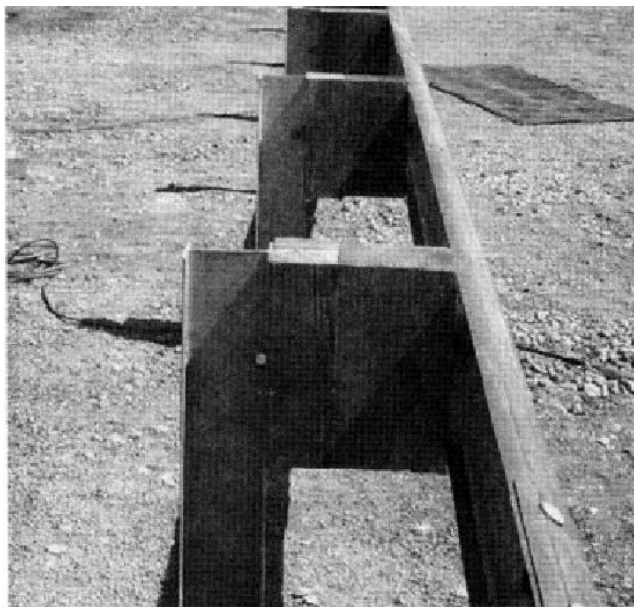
Photo of the MGS guardrail system. [Sicking02]
